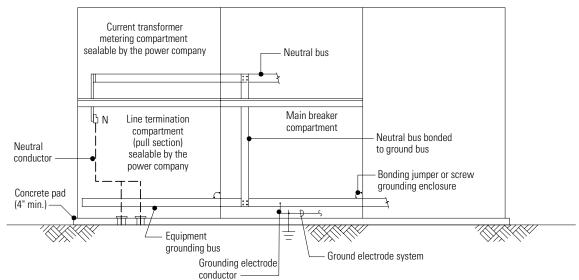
Service entrance grounding and bonding, CT service with metallic conduits.
